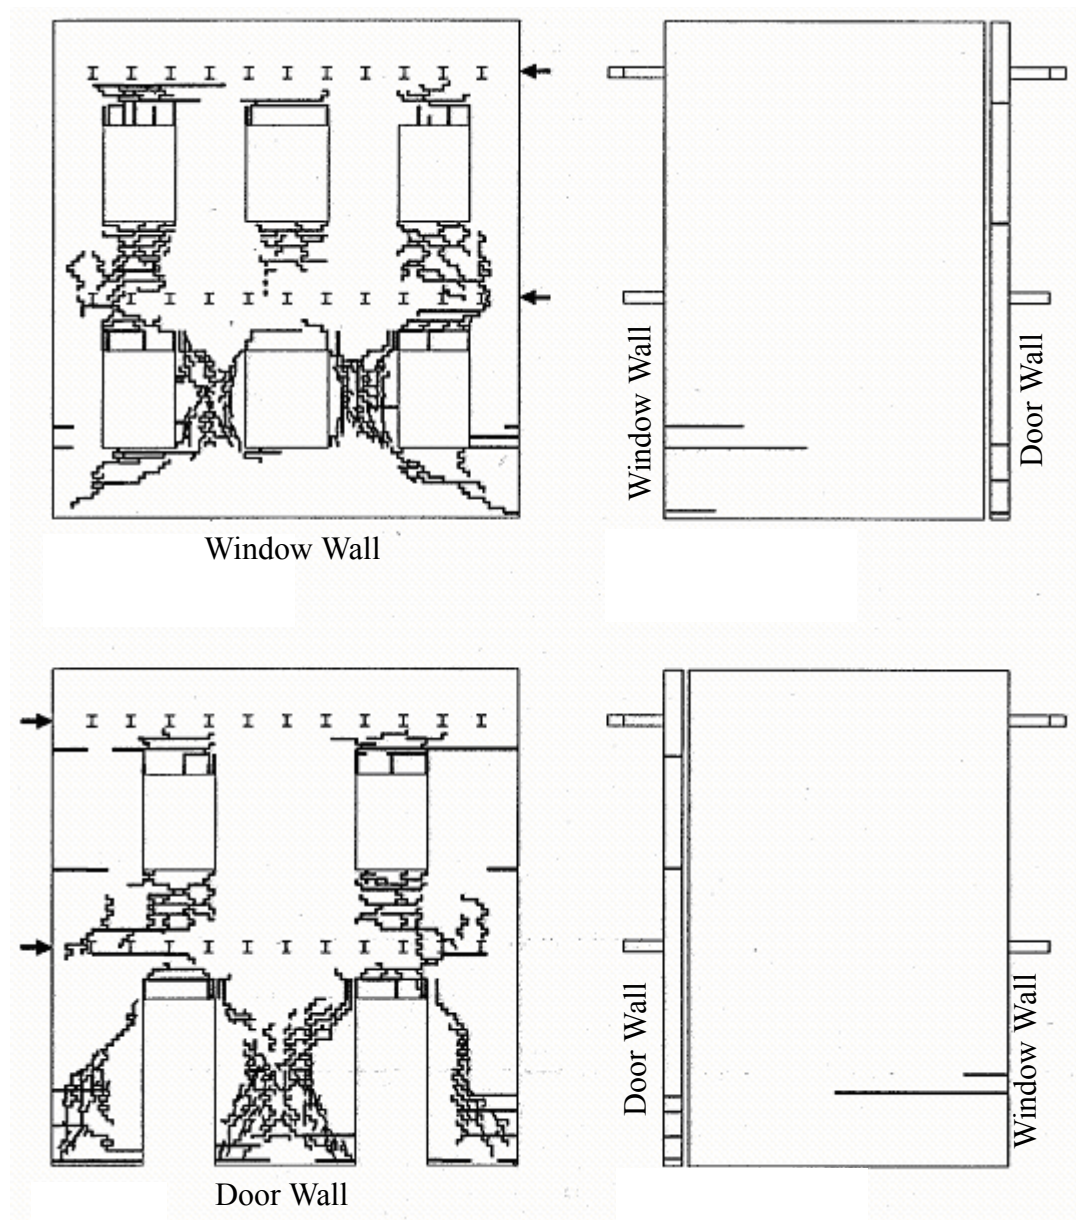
Final crack pattern of the Window and Door Walls (taken from Magenes et al. (1995).
